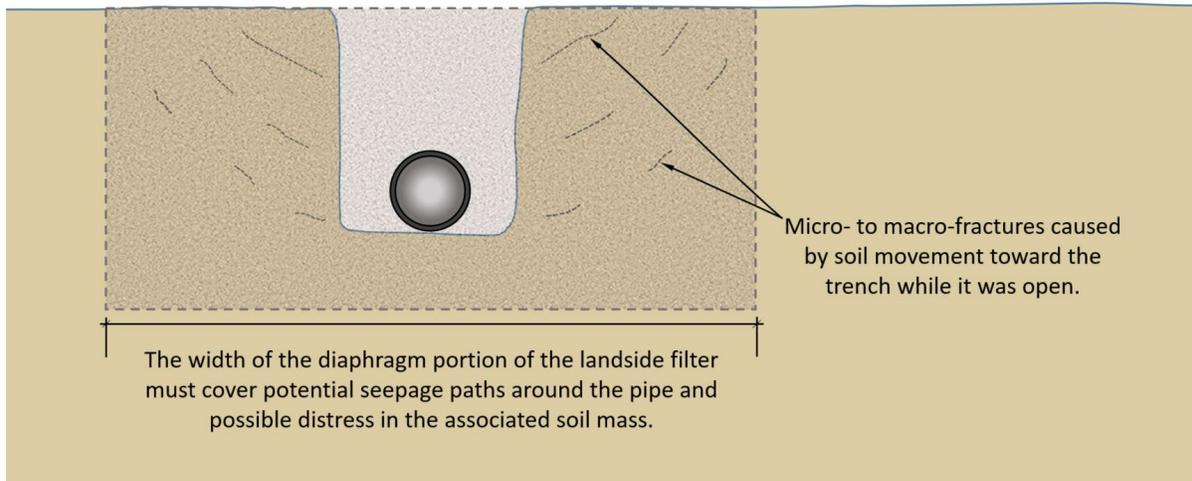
Cross-section of filter diaphragm, wide enough to cover potential soil defects.
